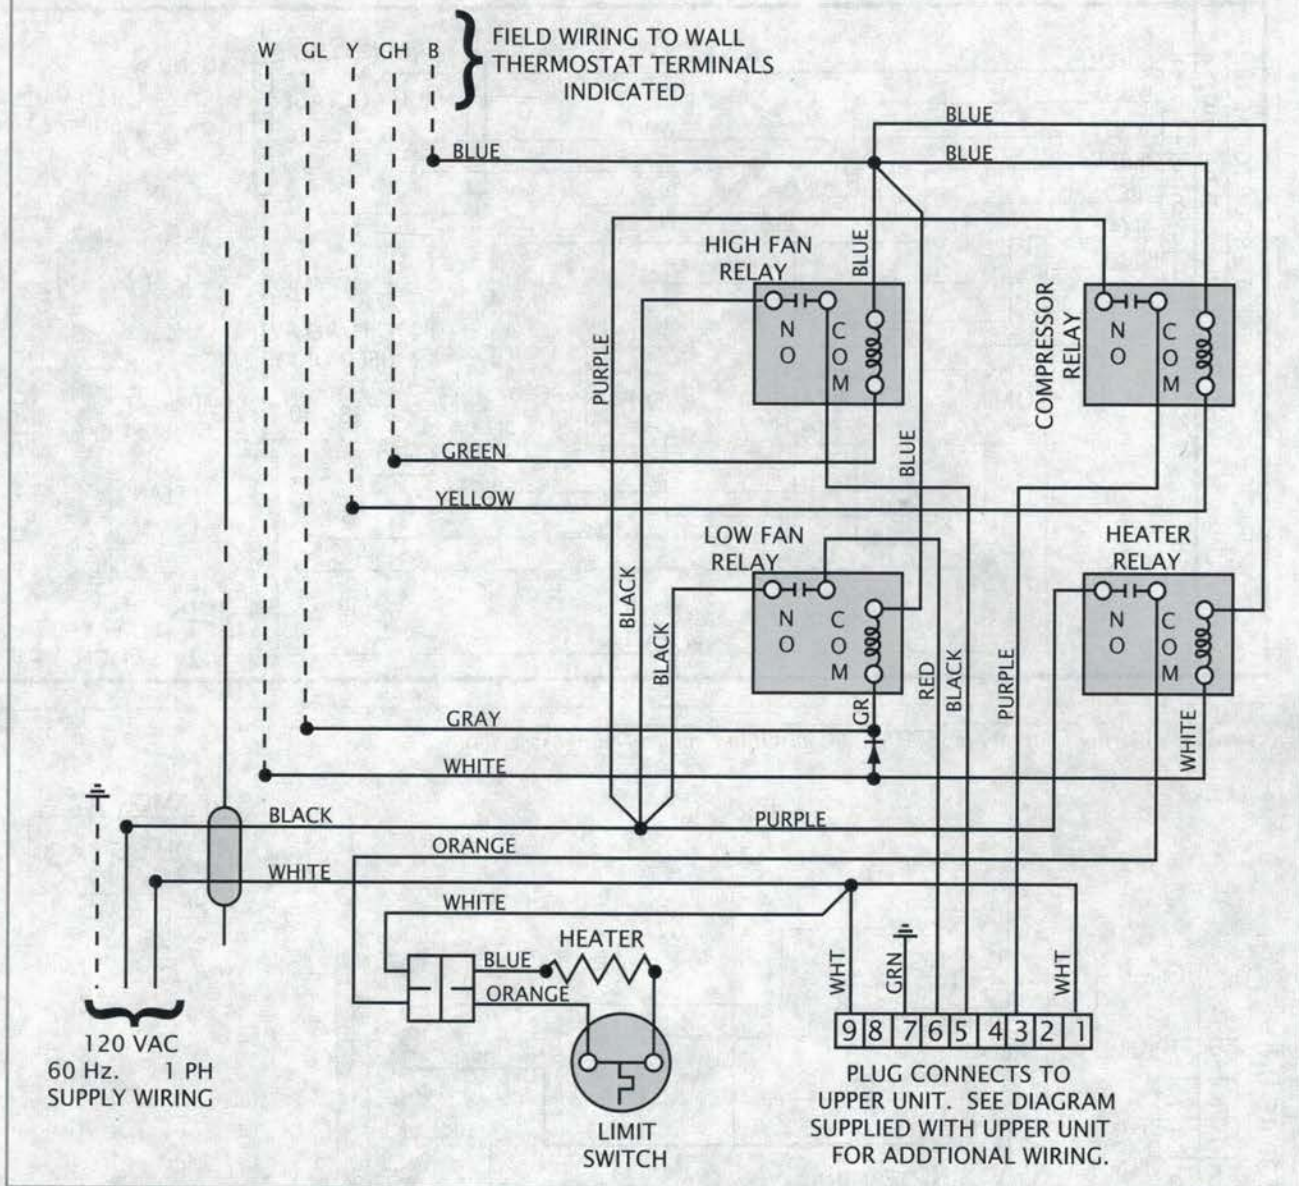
Wiring Diagram for 7330-720 AND 8330-723 Cool-Only Remote Free Delivery Ceiling Assemblies
